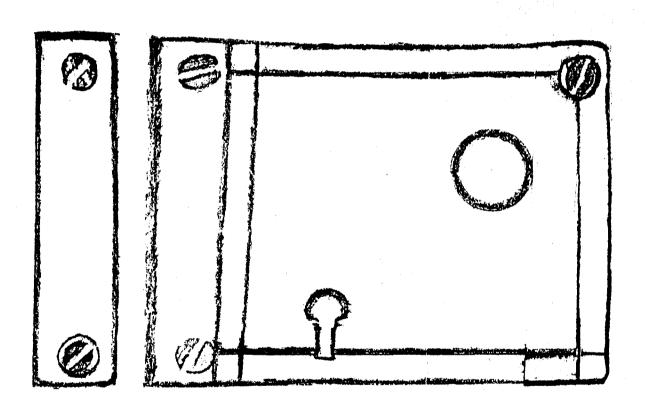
LOCK FACING ON THE NORTH EXTERIOR DOOR IN THE LIVING AREA (The Rubbing Study)
